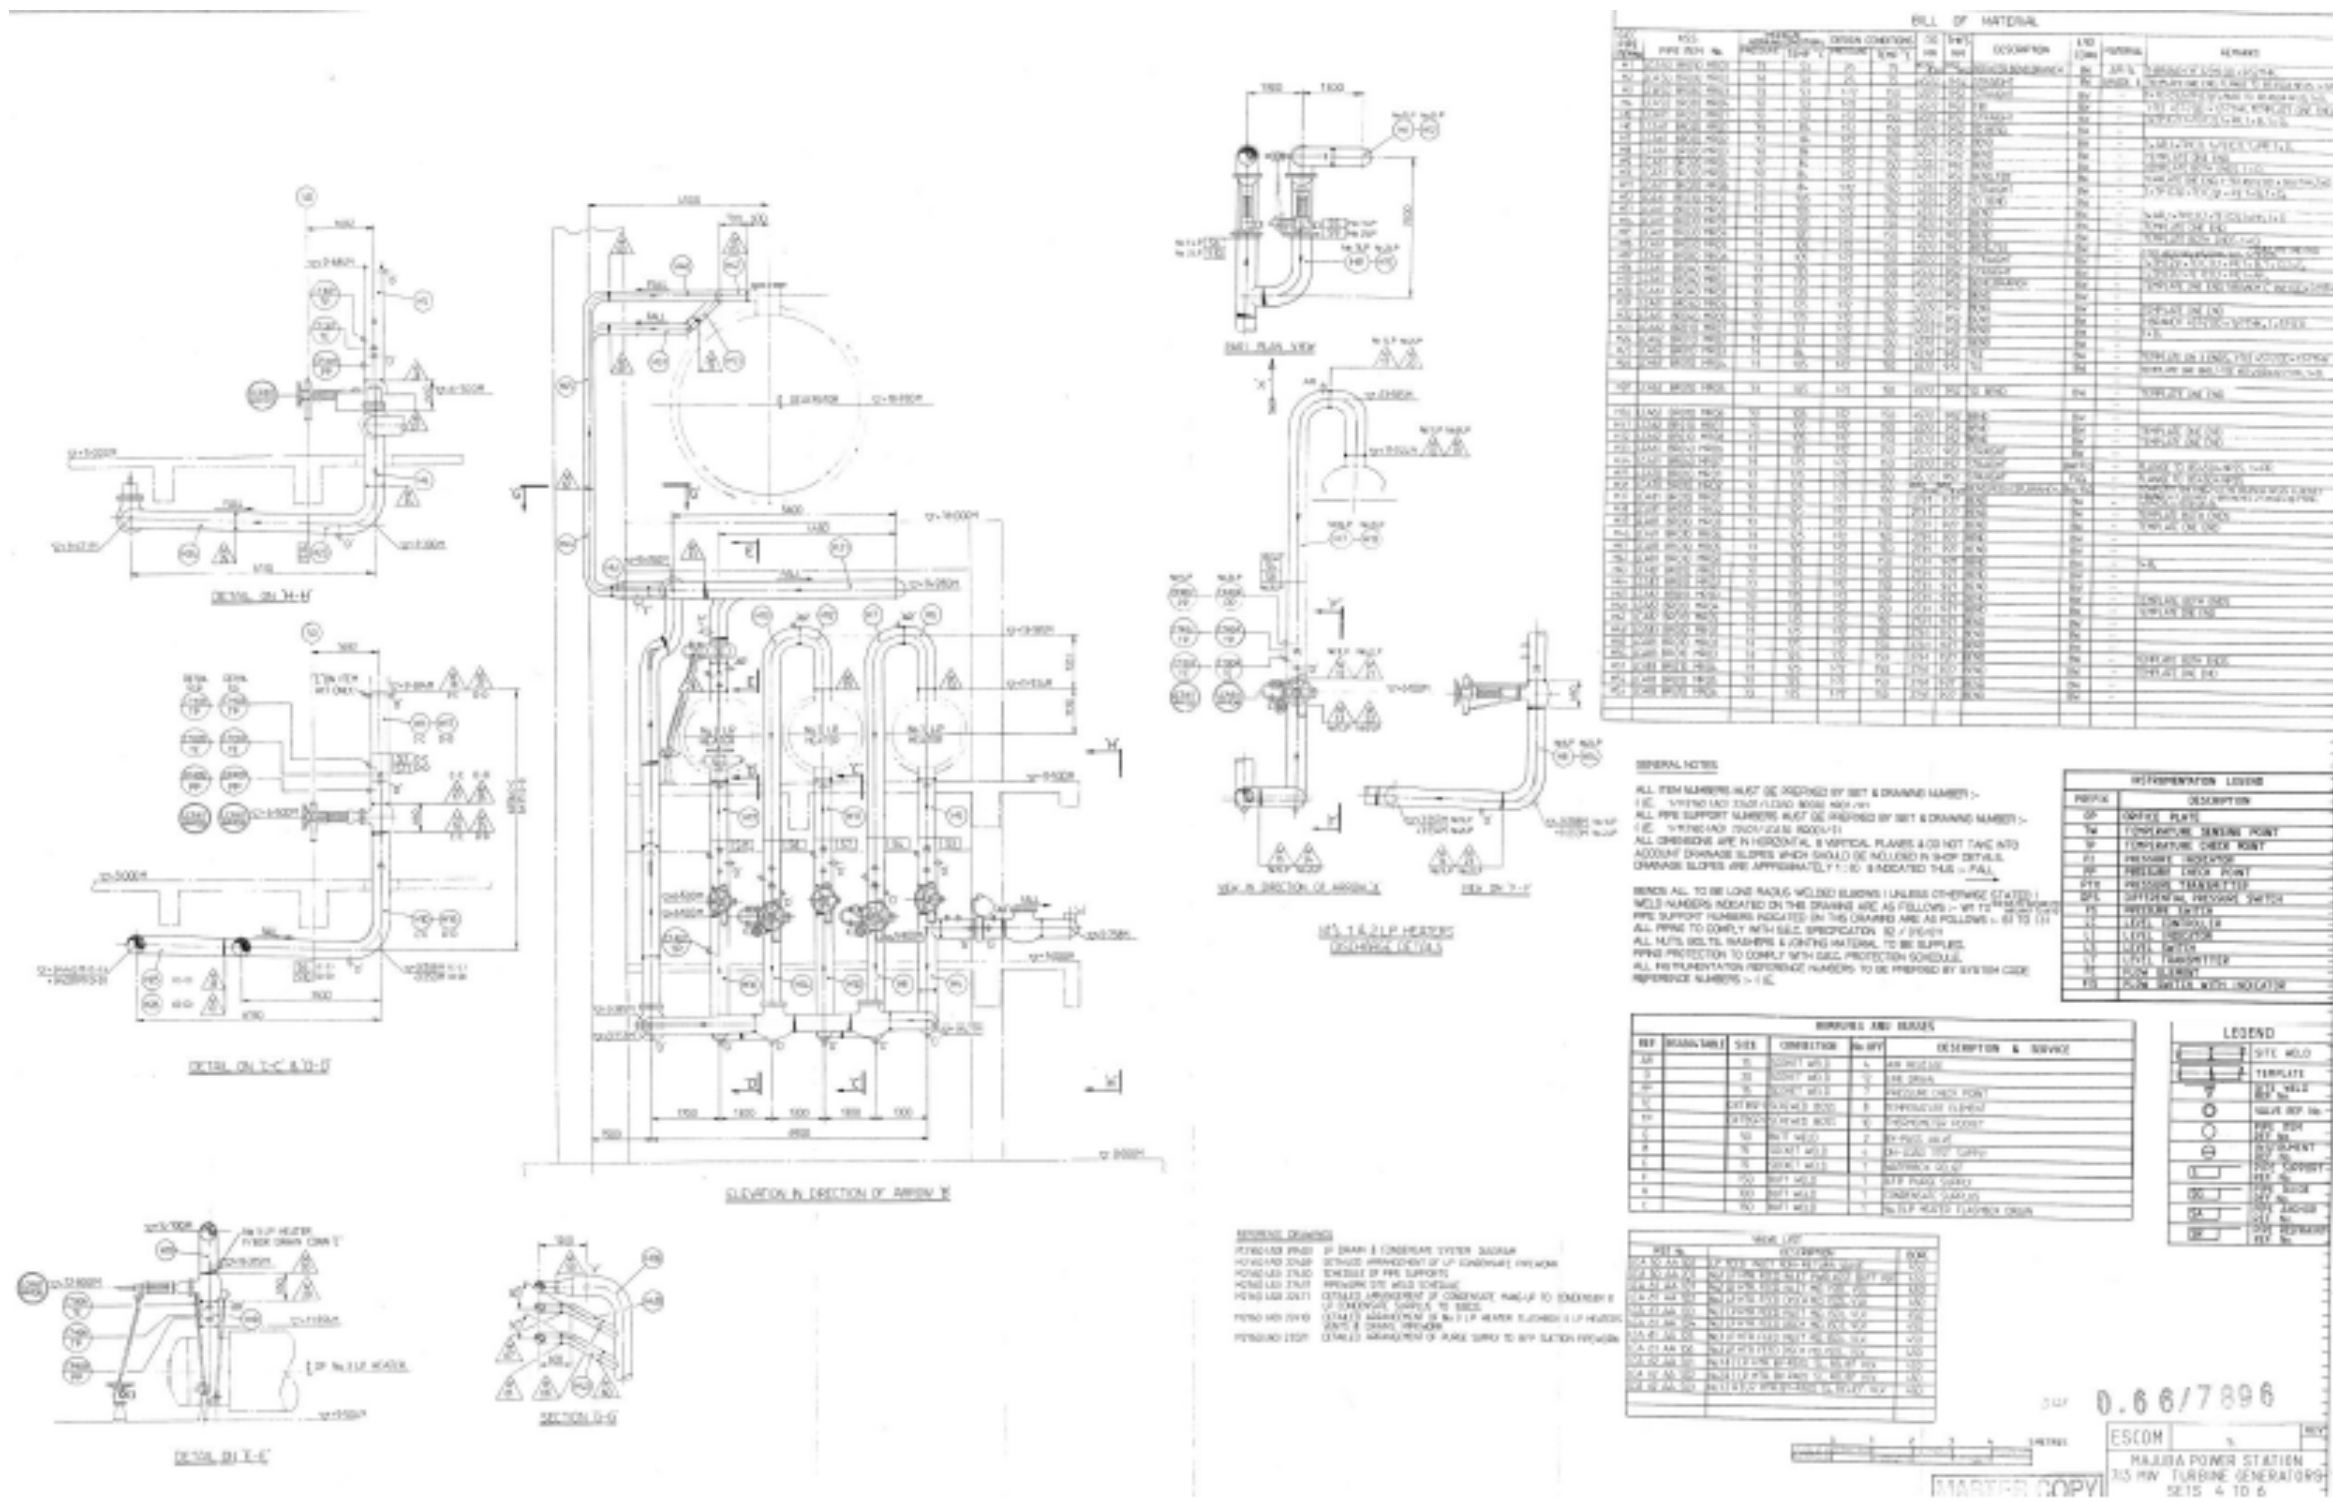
LP Feed-Heating System Detailed Plant Arrangement Drawing A
